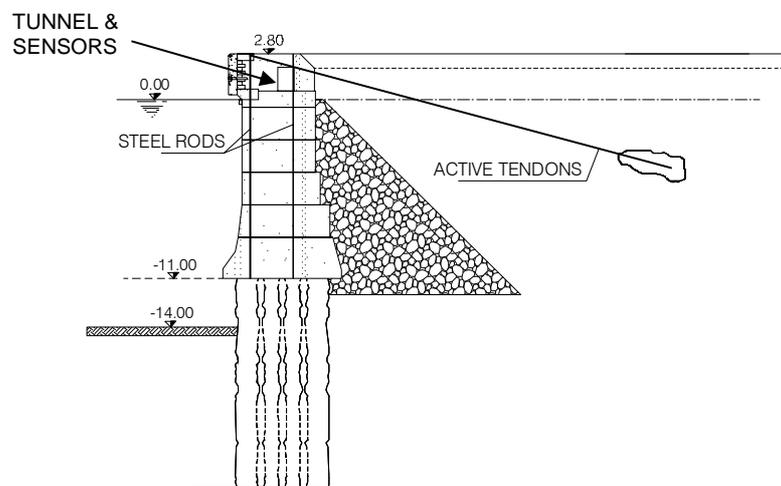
San Giorgio Pier – East wall cross section and location of sensors
